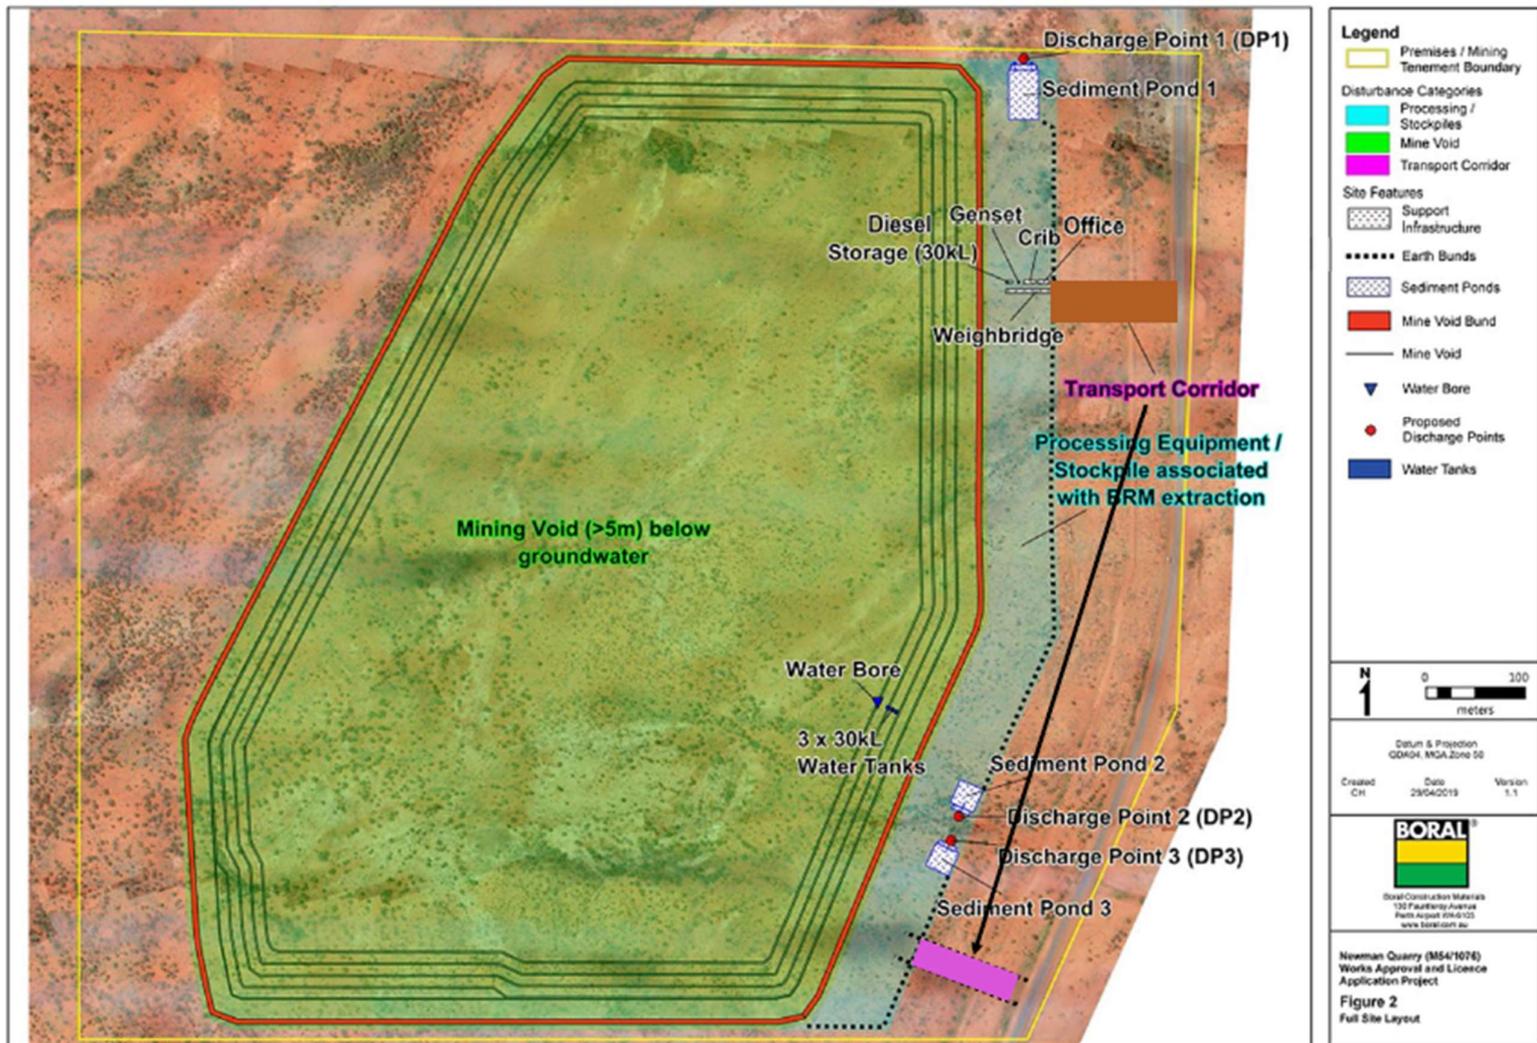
Site Layout Plan (Image provided as part of works approval application supporting documentation and modified to reflect change to transport corridor / access road)
